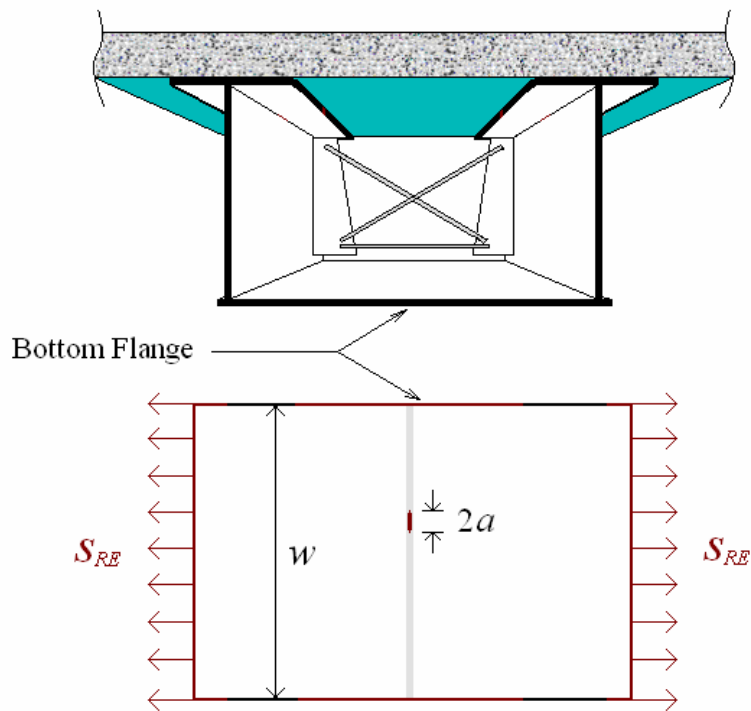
Detail in the Fracture-Critical Member of the Box Girder Bridge.
